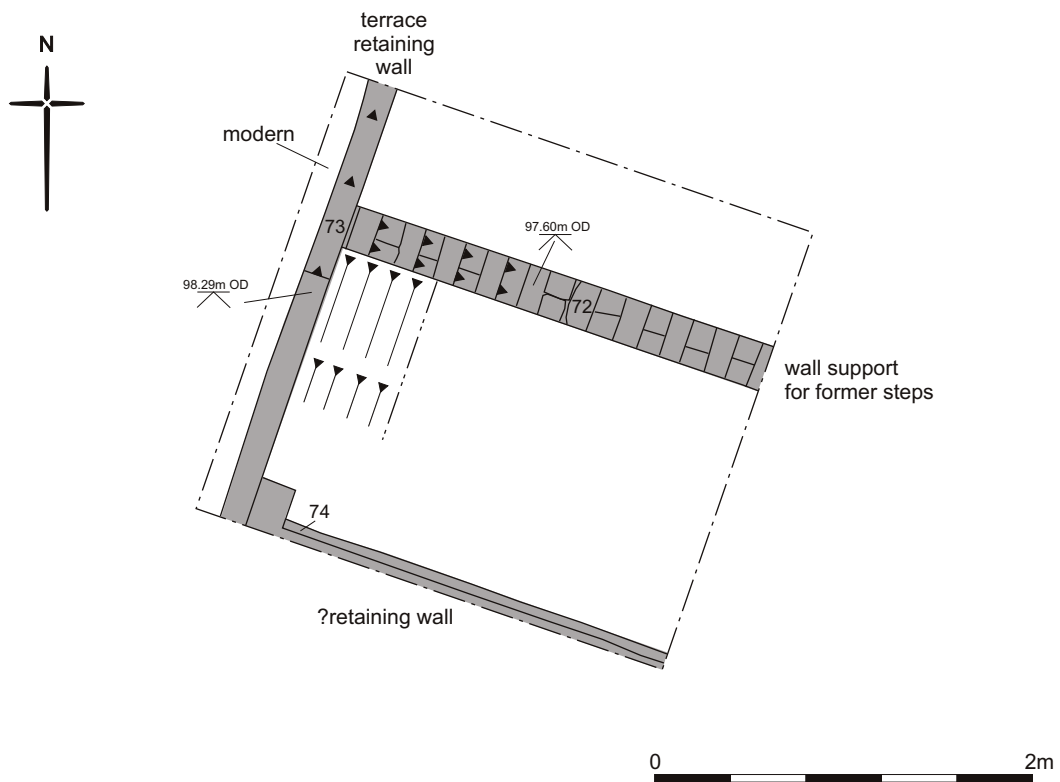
Test pit 3, plan of terrace retaining wall and supports for former stairs
